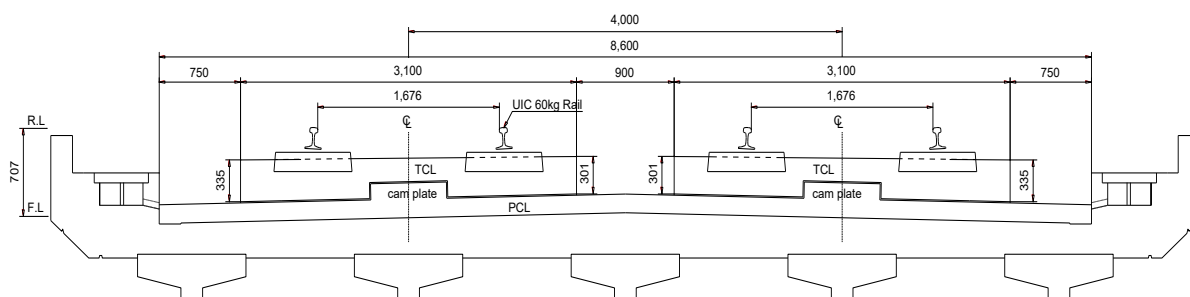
Cross-section of Non-Ballasted Double Track on Elevated
